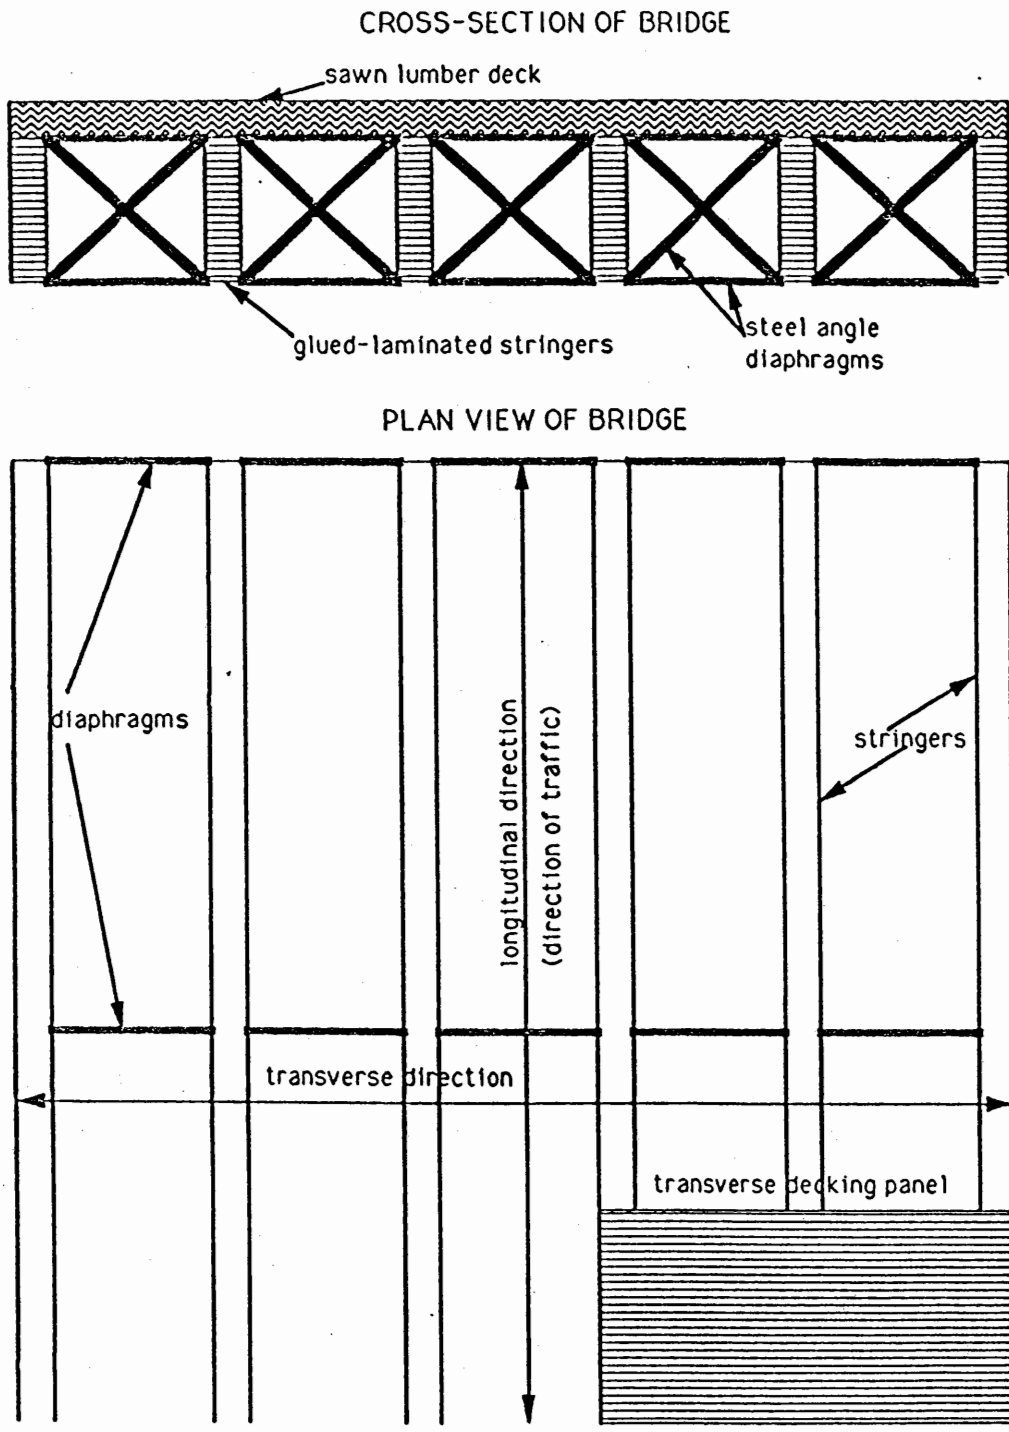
Timber Bridge with Longitudinal Stringers, Transverse Decking, and Diaphragms
